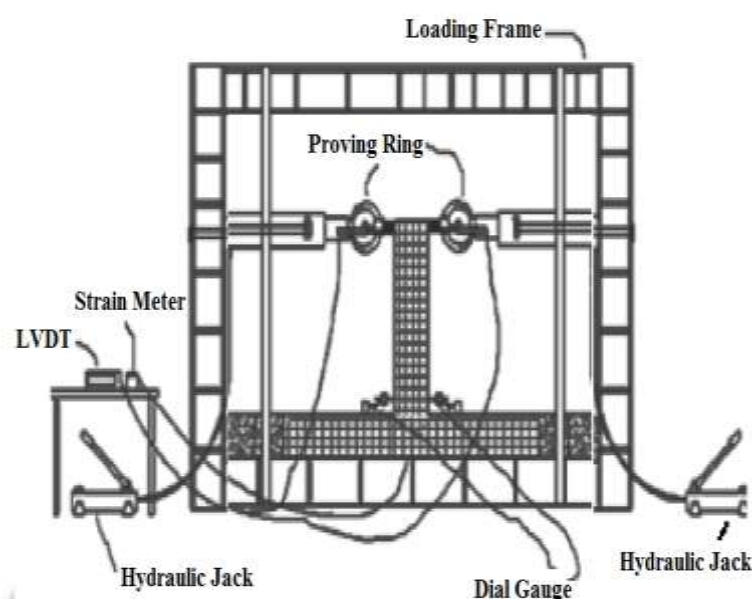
Loading Frame Setup for Beam Column Joint Analysis
